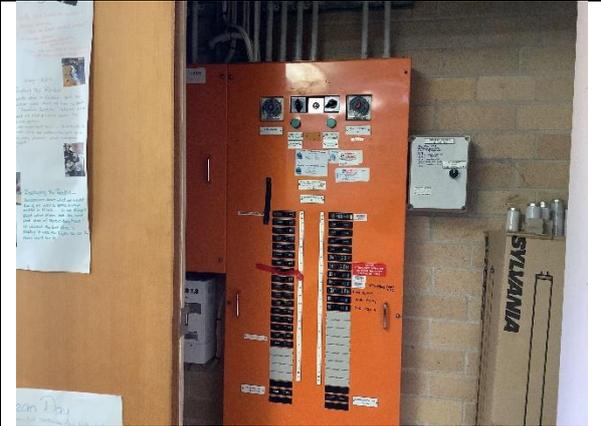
Building H – H.G.16 – Electrical Distribution Board – Compressed Bituminous Electrical Panel
